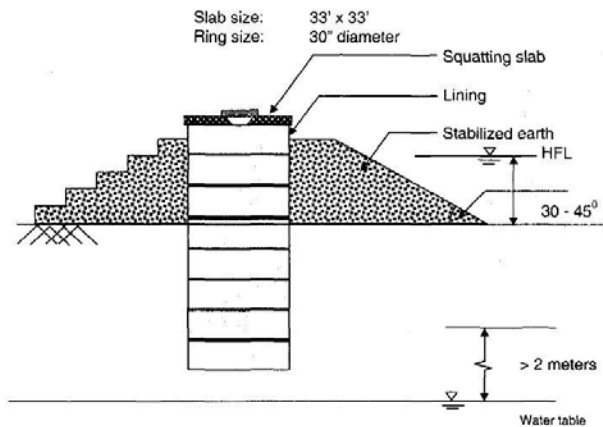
Earth stabilized Raised Pit Latrine (Kazi, 2003).
